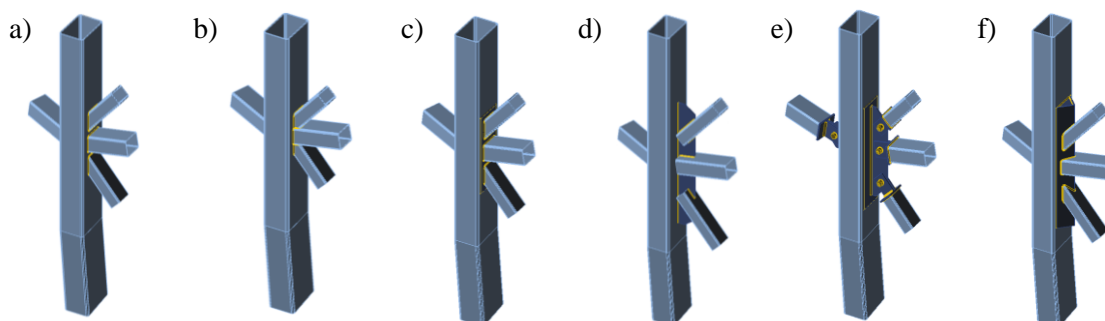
Design versions of the node made of bent-welded rectangular tubes
